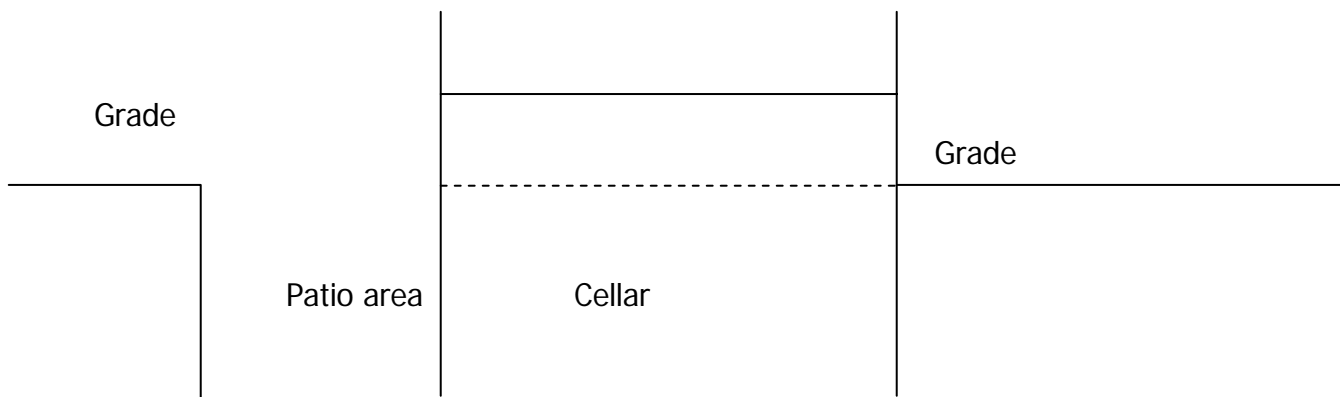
Cellar: That portion of a building between floor and ceiling which is partly below and partly above grade, but so located that the vertical distance from grade to floor below is greater than the vertical distance from grade to ceiling above.
